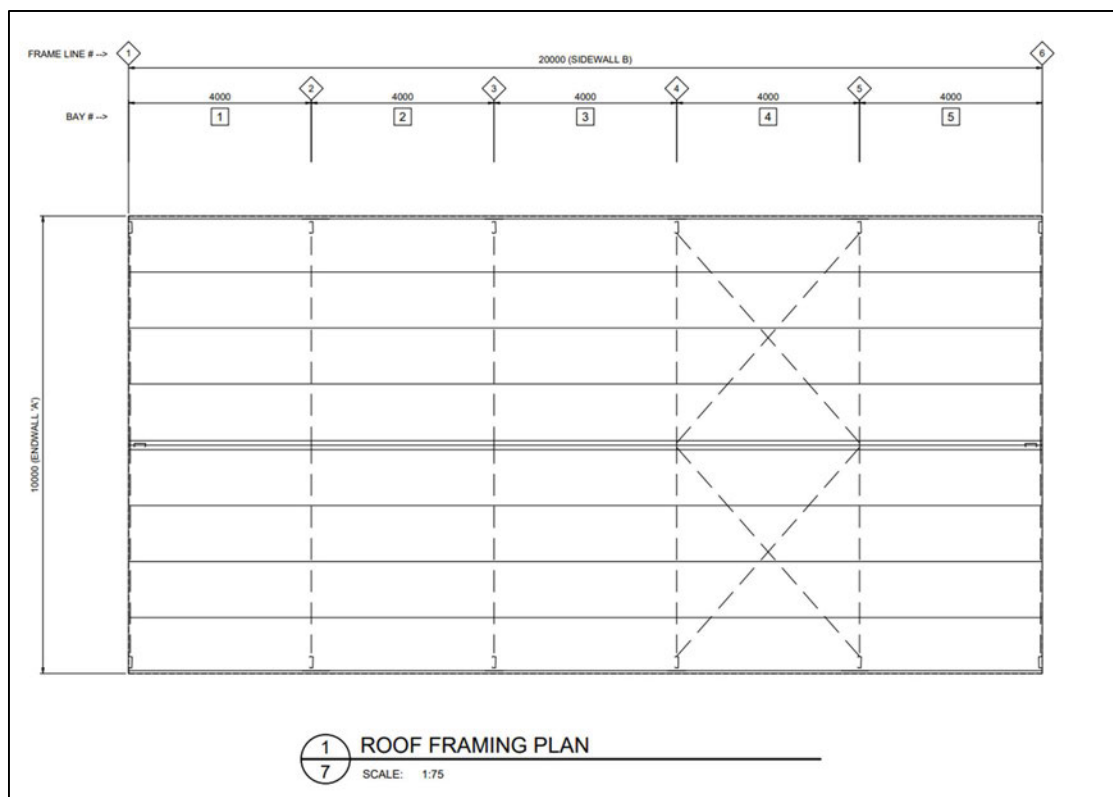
Roof Framing Plan 1/7 Prepared by Emerald Design and Construction (Appendix 2)
